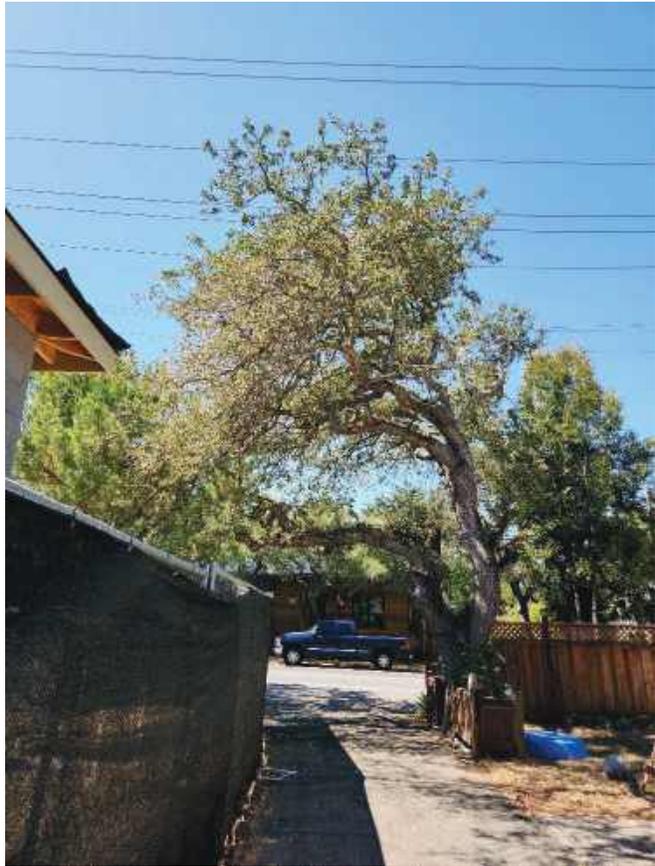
The driveway next to the blue oak (#3) will be demolished; afterwards, the driveway and landscape area should be protected from construction impacts. Various options are provided for the contractor's selection.
